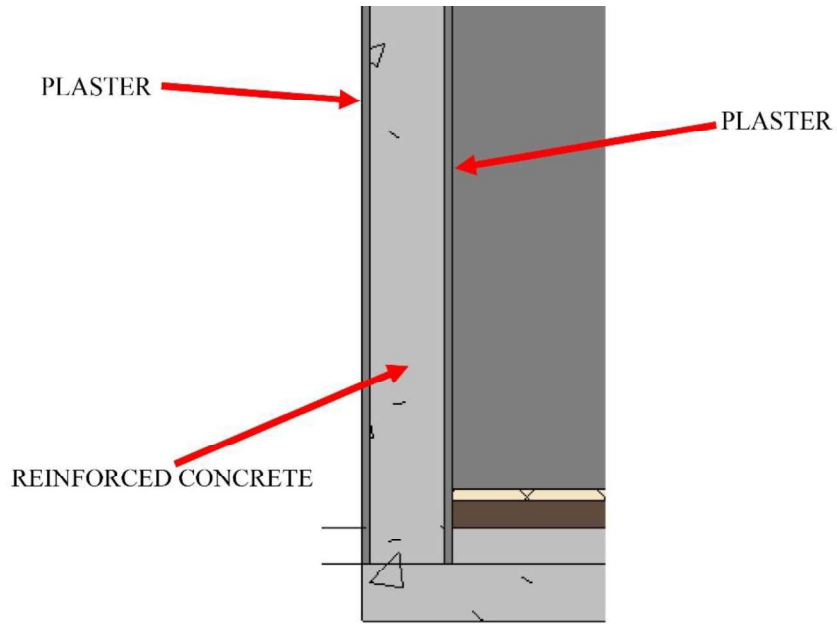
Wall section showing construction materials. Source: Revit Autodesk 2020 by Author
